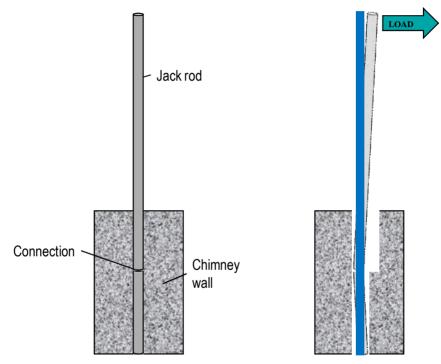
Conceptual illustration of wind-induced concrete damage during construction.
